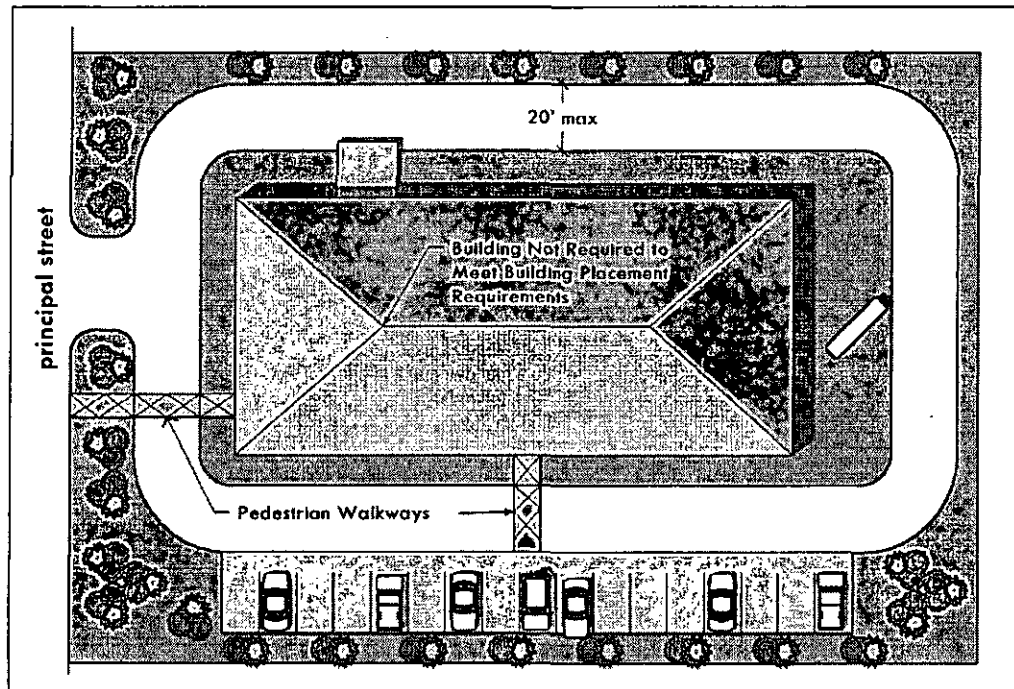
Drive-through uses serviced by a single curb cut do not have to meet the building placement standards in order to allow for a circulation lane.
